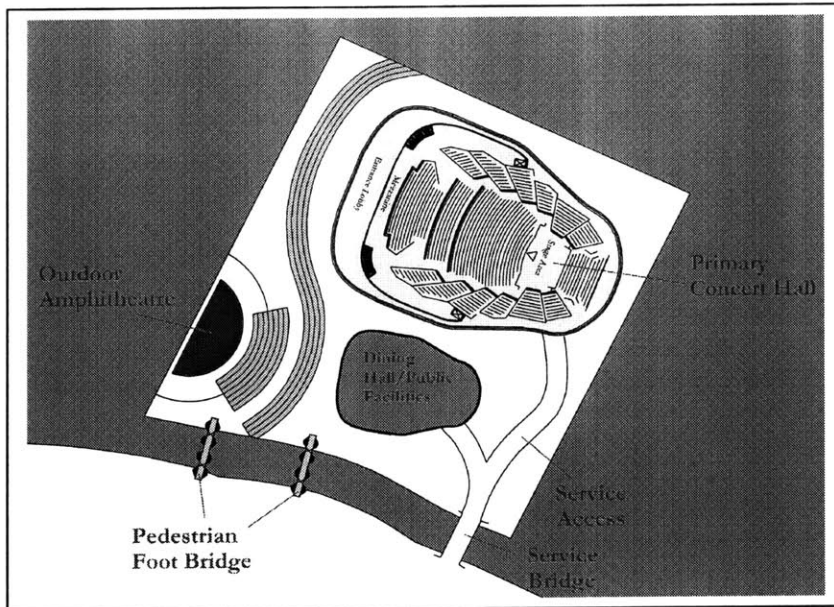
Site layout for CCPA (Chen et al., 2004).
